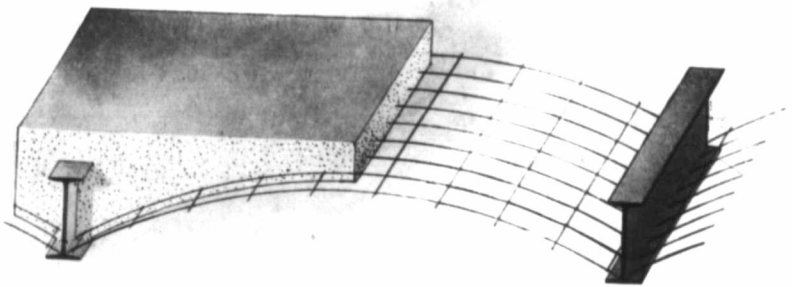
shows a heavy construction, with spans of 6 feet centre to centre.
